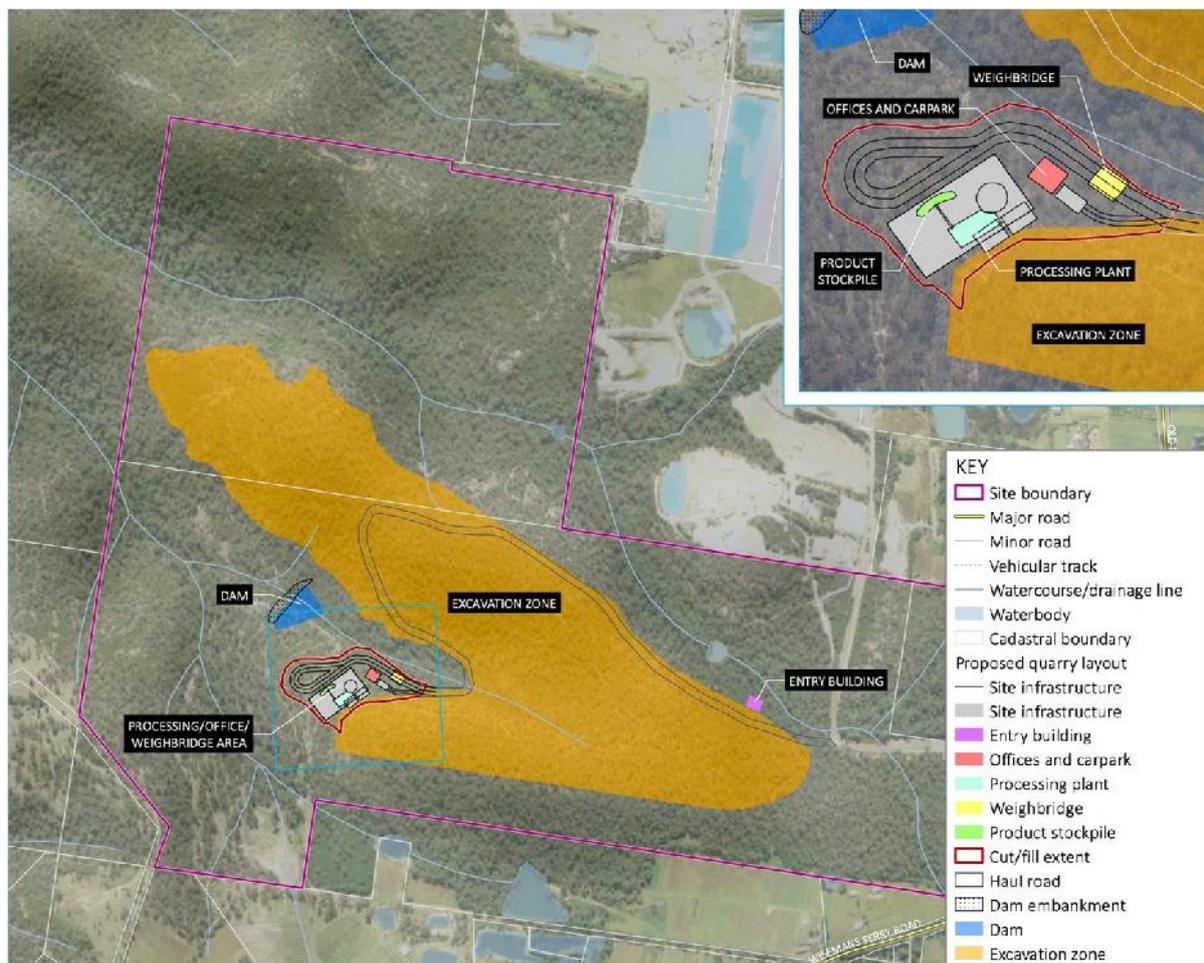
Proposed Site Layout (Source: RPM Global & EMM, 2021)
